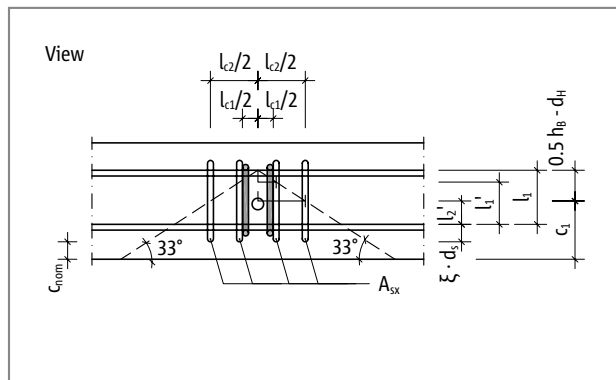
Schöck Dorn type SLD: Dimensions of the breakout cone of the concrete edge
